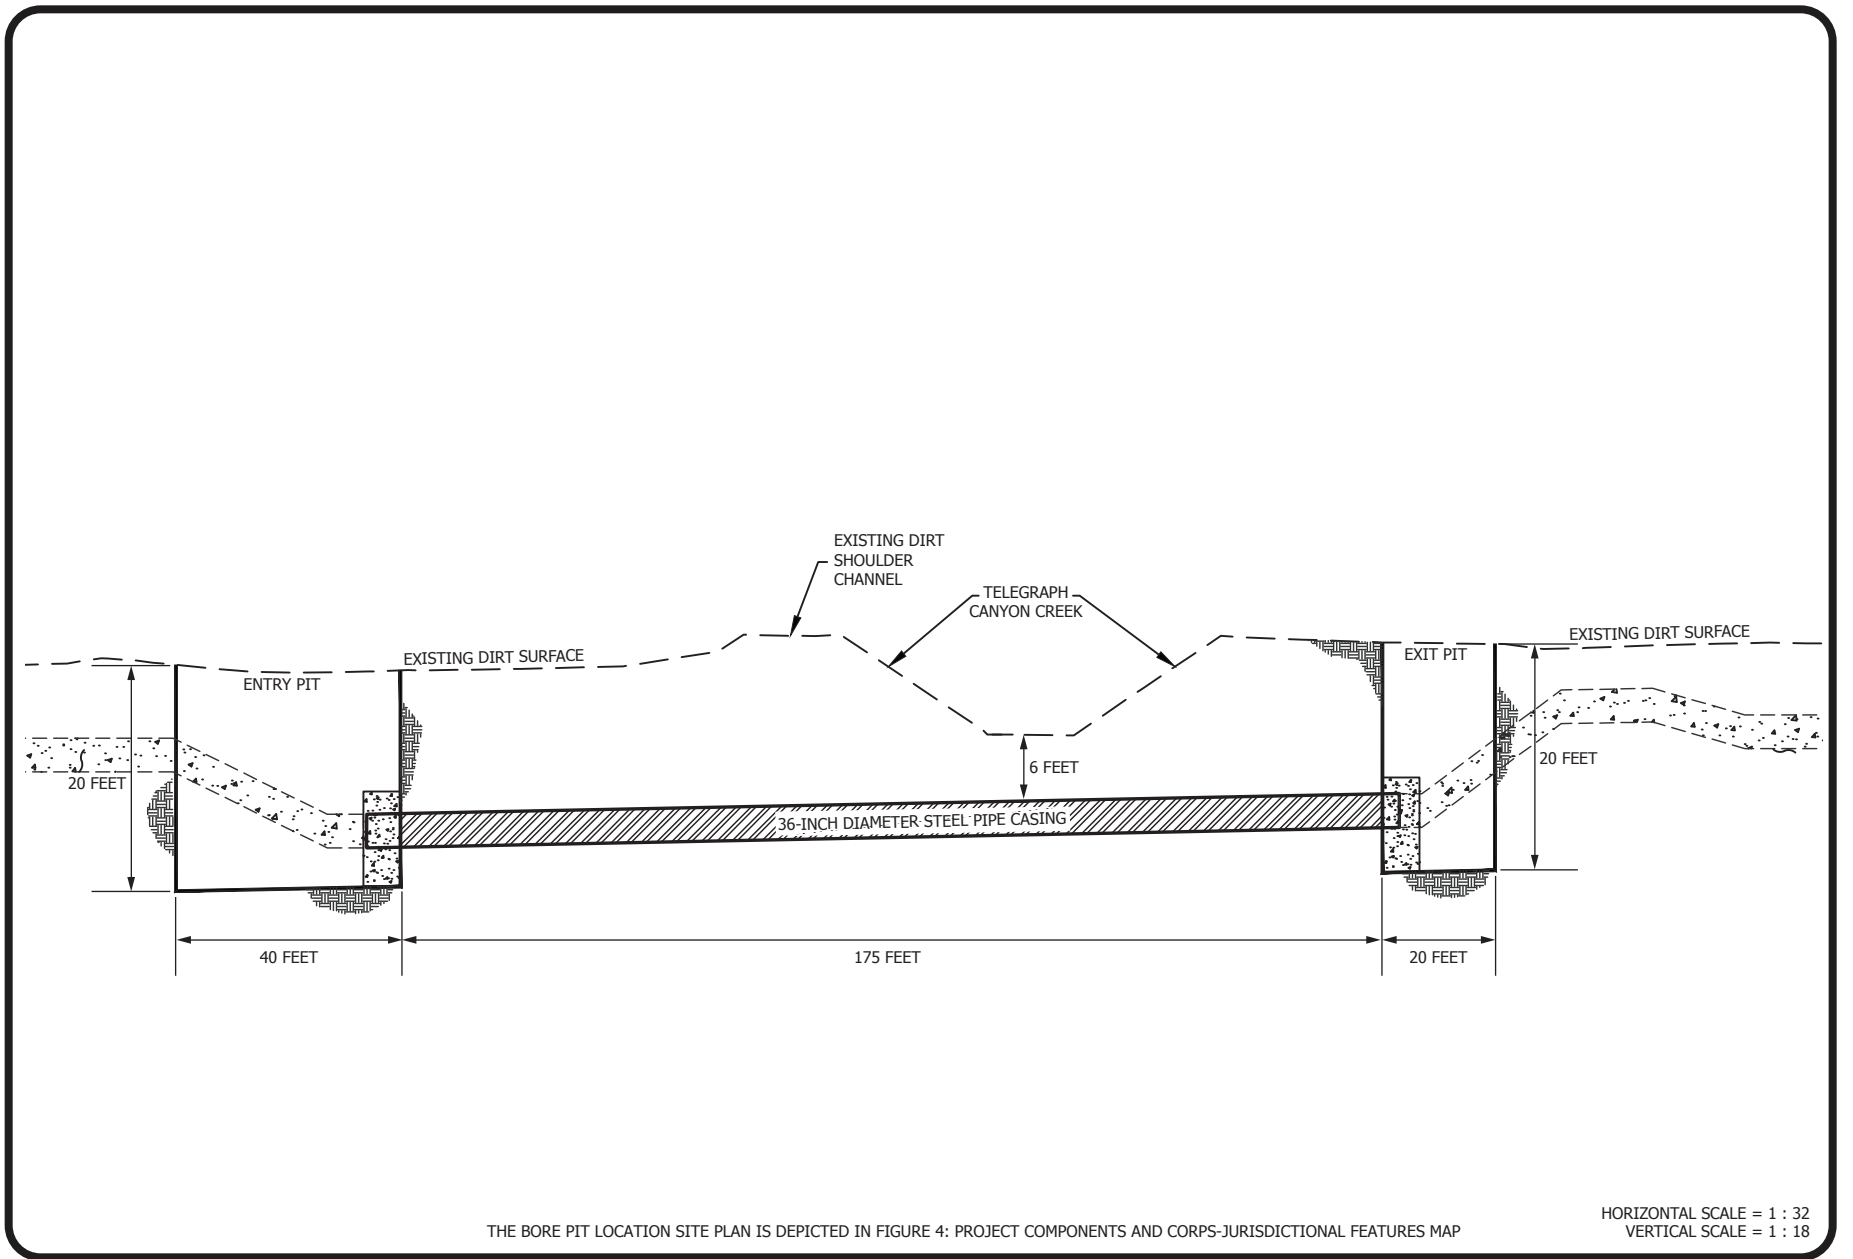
Preliminary Jack-and-Bore Cross-Section Drawing
